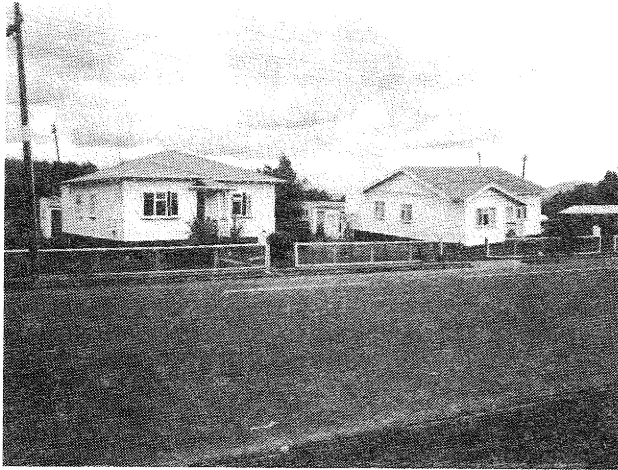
Two near identical houses on lightly braced jackstuds and concrete piles. The house on the right has toppled off, the one on the left is laterally displaced at floor level.
